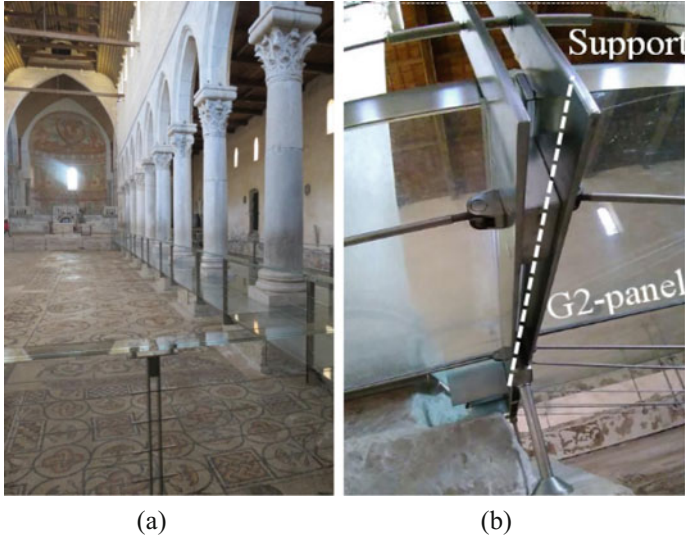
The case-study glass suspension footbridge: (a) general view and (b) detail
